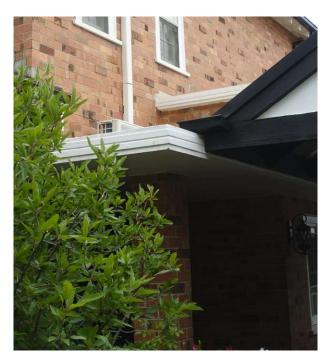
Detail of the front entry on the north side of the house. Note the same concrete slab profile, with incised horizontal lines, as seen on the sunporch, indicating that it was created with the same formwork mould. (Source: Context, 2019)
